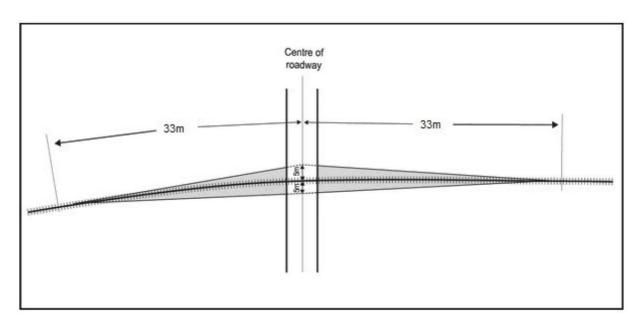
Restart sight triangles for public road/rail siding level crossings.
